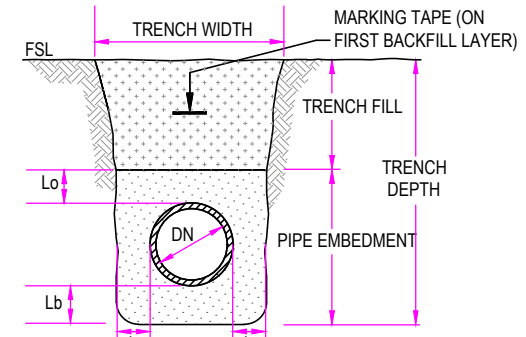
B: TYPICAL SINGLE PIPE SUPPORT & TRENCH FILL
